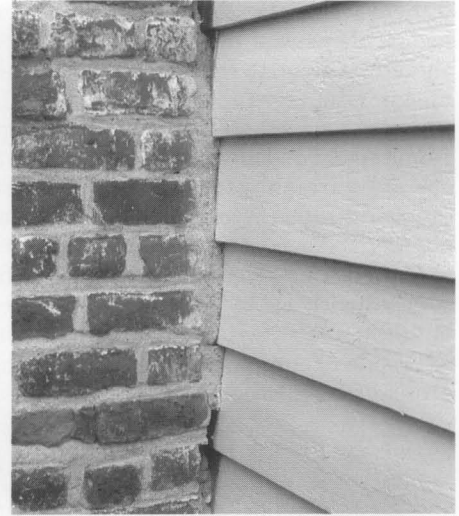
Appropriate mortar mixes should be used when masonry repairs are undertaken. In this case, a soft lime based mortar is used as an infill between the brick and wooden elements. When full repairs are made during the restoration phase, this soft mortar can easily be removed and missing bricks replaced.
